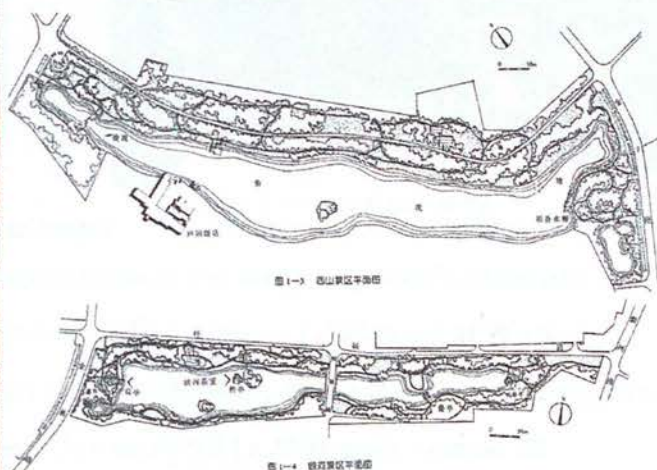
Hefei Walled City Park plan by Hefei's Landscape
